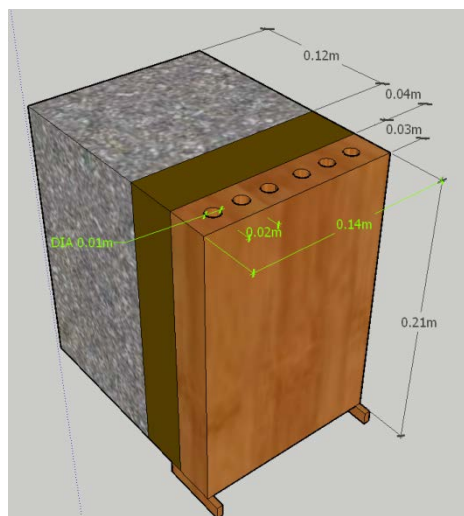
Sketch of the wood sample with rock wool glued and reinforced concrete attached on it
